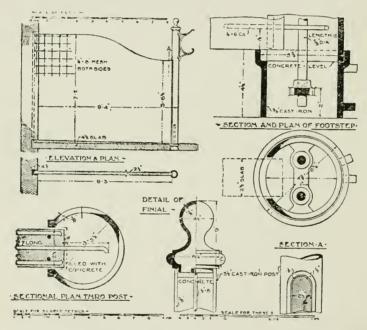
DETAILS OF SOME REINFORCED CONCRETE STALLS AT STABLES IN WINTECROSS STREET, LONDON.
